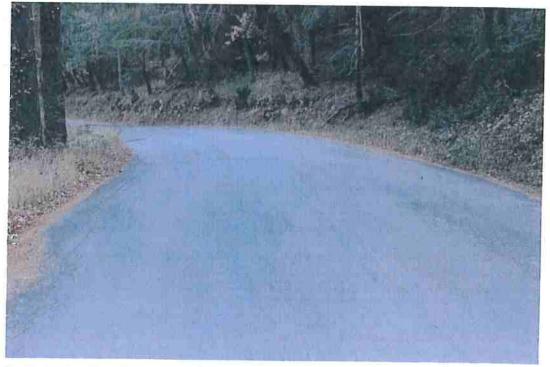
Mile 1.1: 20-ft road width with 2-ft shoulders.
